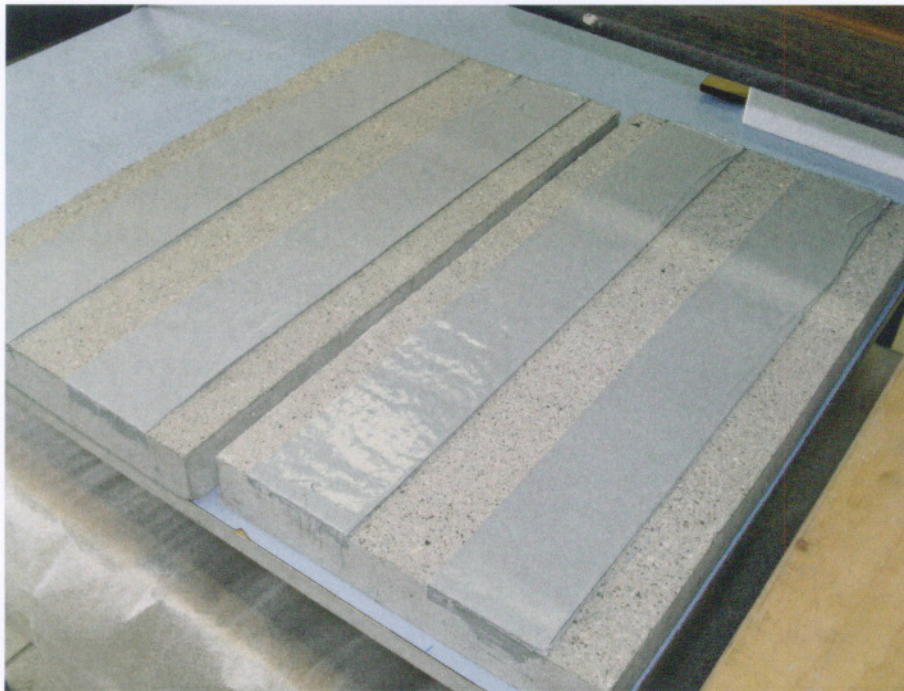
Test specimens coated with FlexproofX® 1 for checking the endurance of the adhesive bond when stored in water
